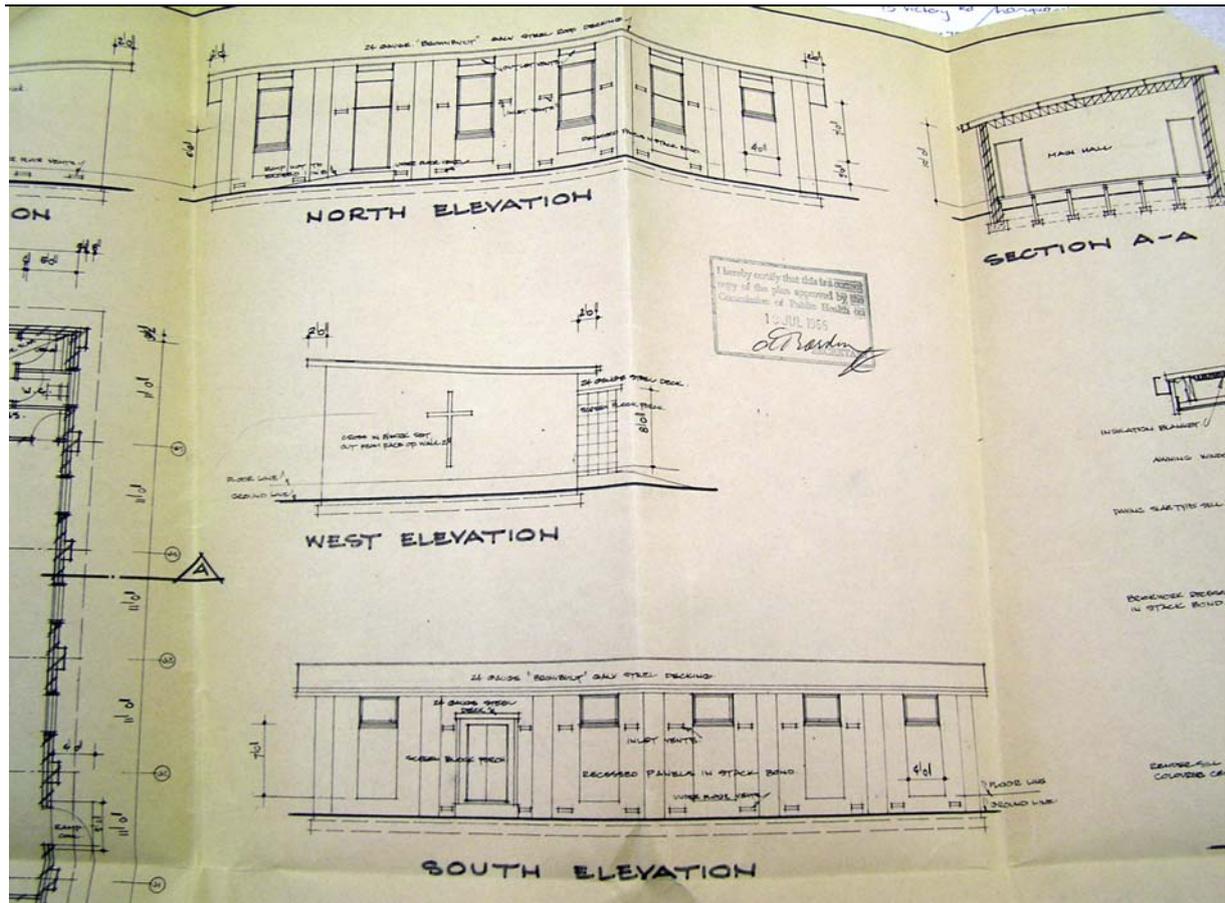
R.L. Strickland & Associates, Elevation & Section Drawings of proposed Sunday School at Ballan, 13 May 1966.
